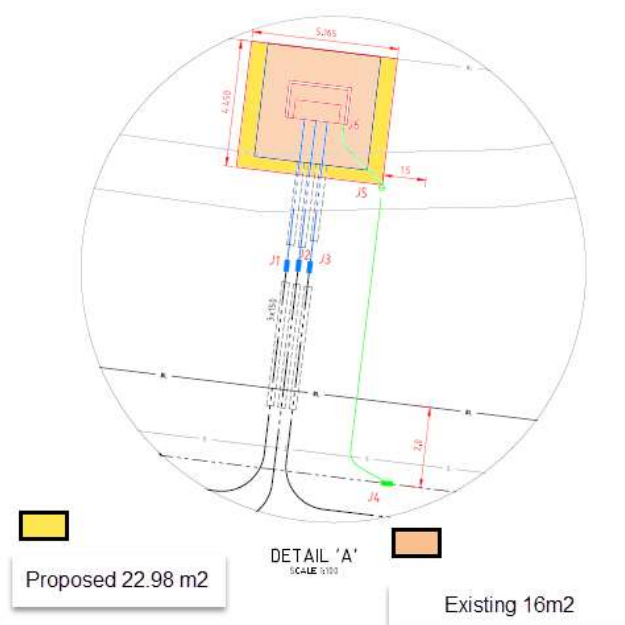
Plan showing proposed installation and upgrade of Switching Station at Penrose Promenade, Tarneit.
